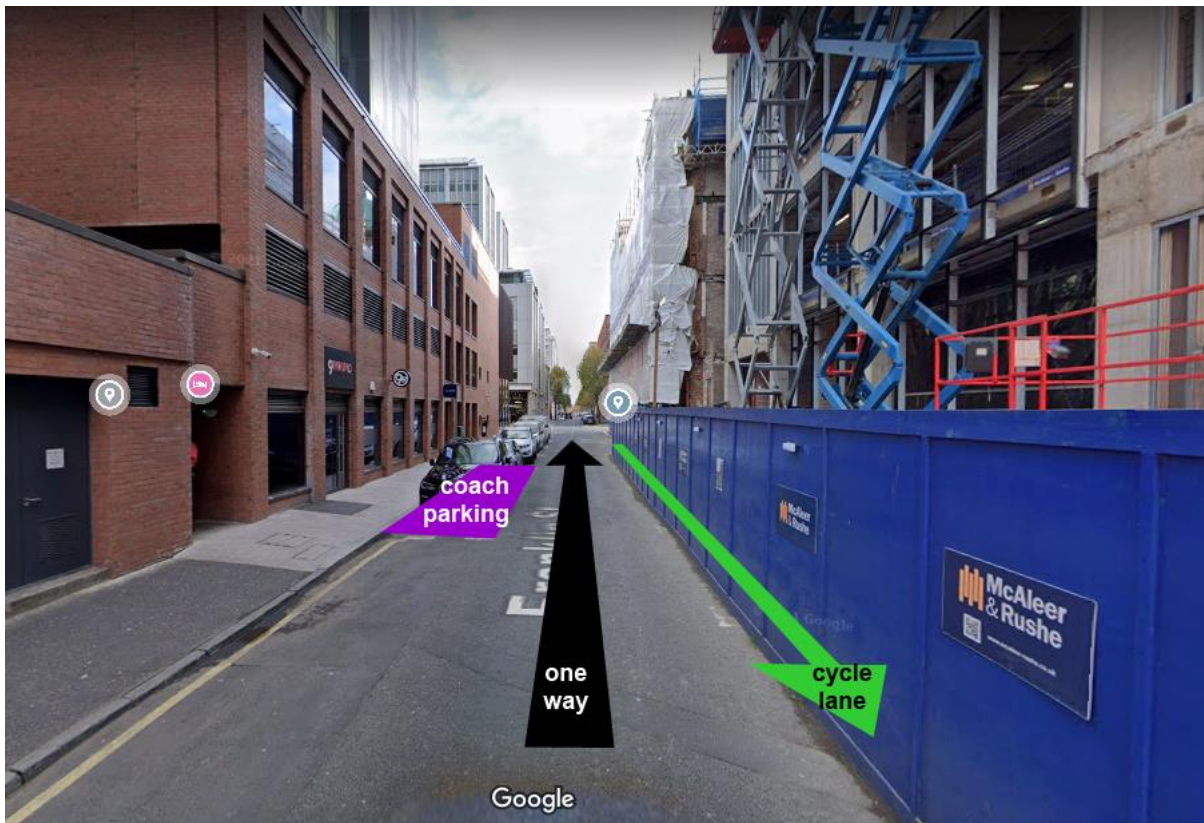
impression of proposed interventions on Franklin Street (view looking East)
